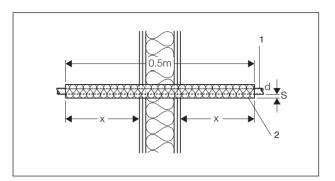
Fire protection Geberit Mepla Ø 16 - 63mm: Wall penetration for drywall installations
